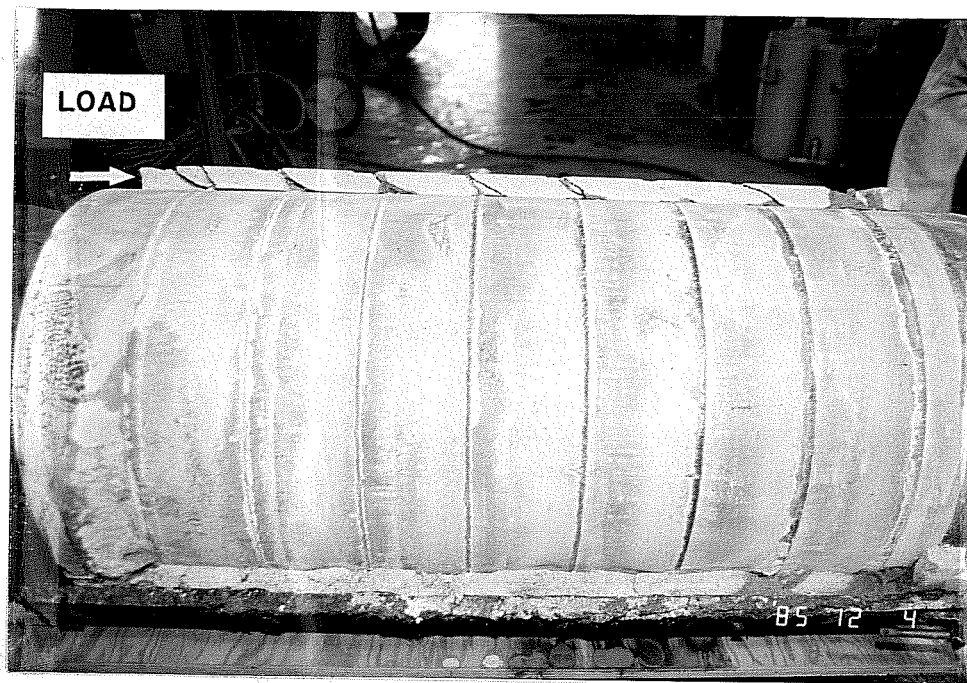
Grout profile of Specimen UTA2 showing crack pattern
